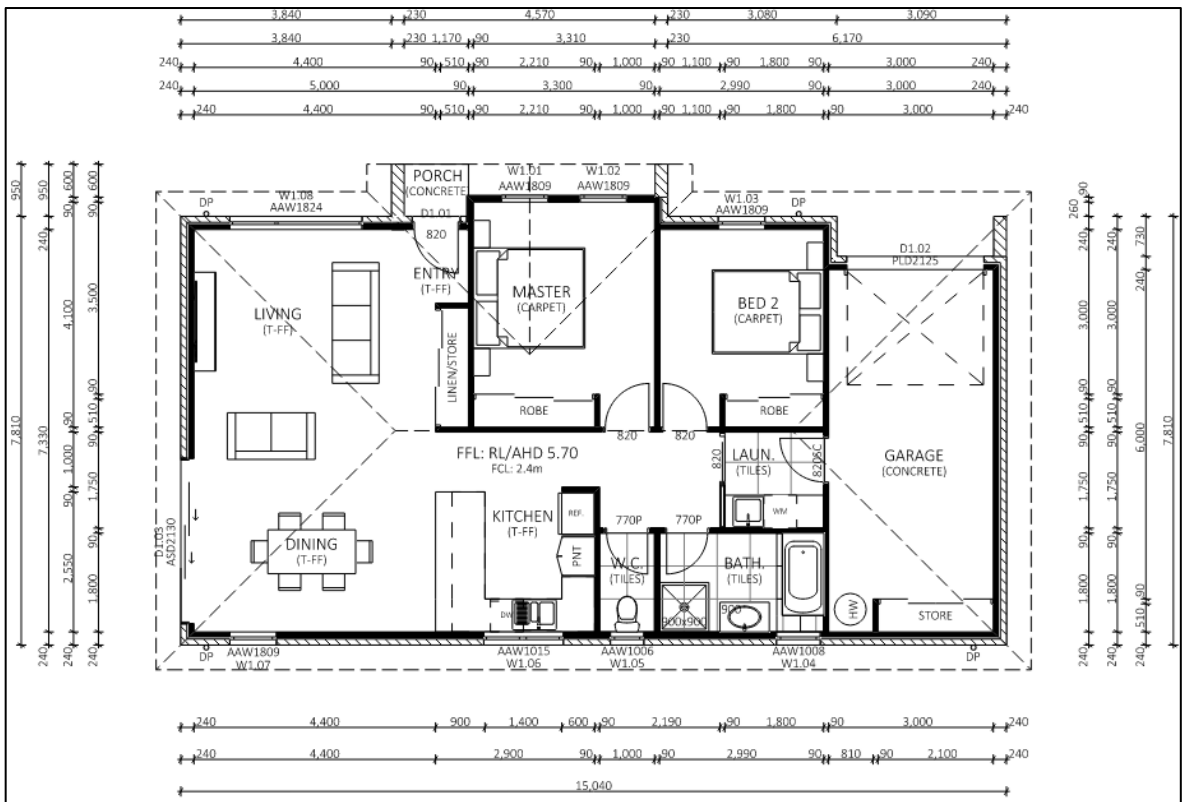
Proposal Plans – Unit 1 - Floor Plan
